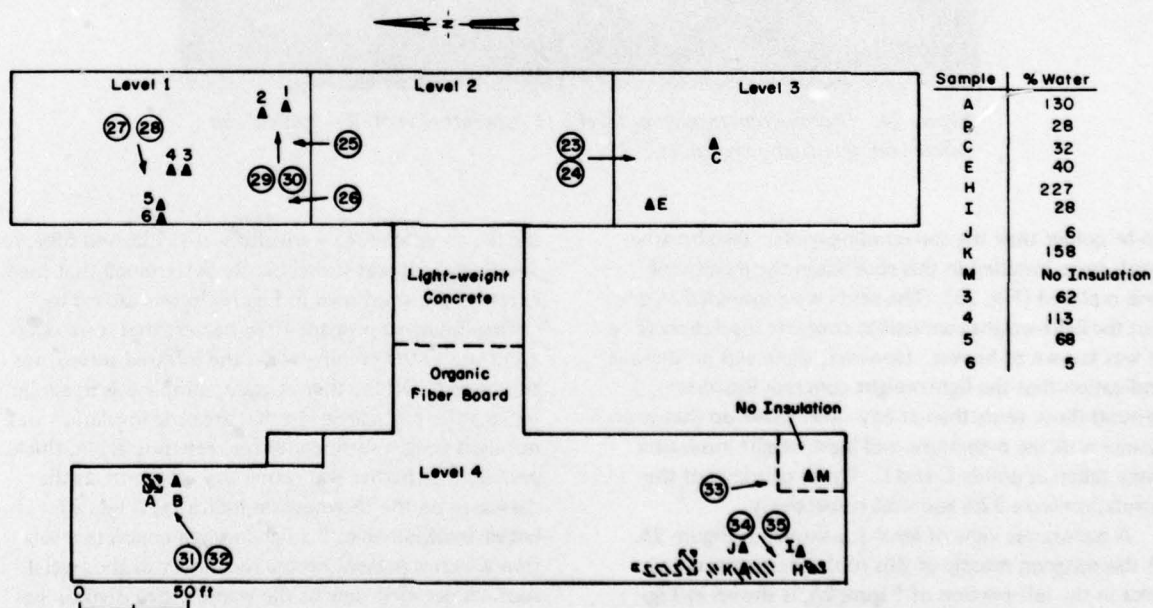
Plan view of the Highway Garage roofs. Samples were not taken at locations 1 and 2.
